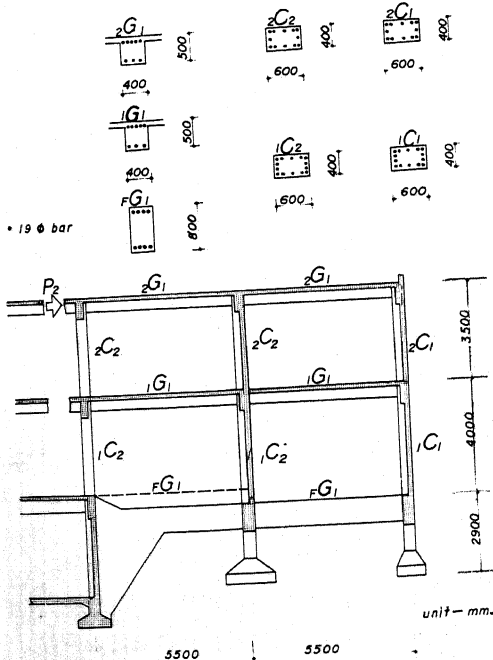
SKELETON OF HAMAMATSU FRAME (A PAIR OF FIG. 2 WALLED FRAME)
